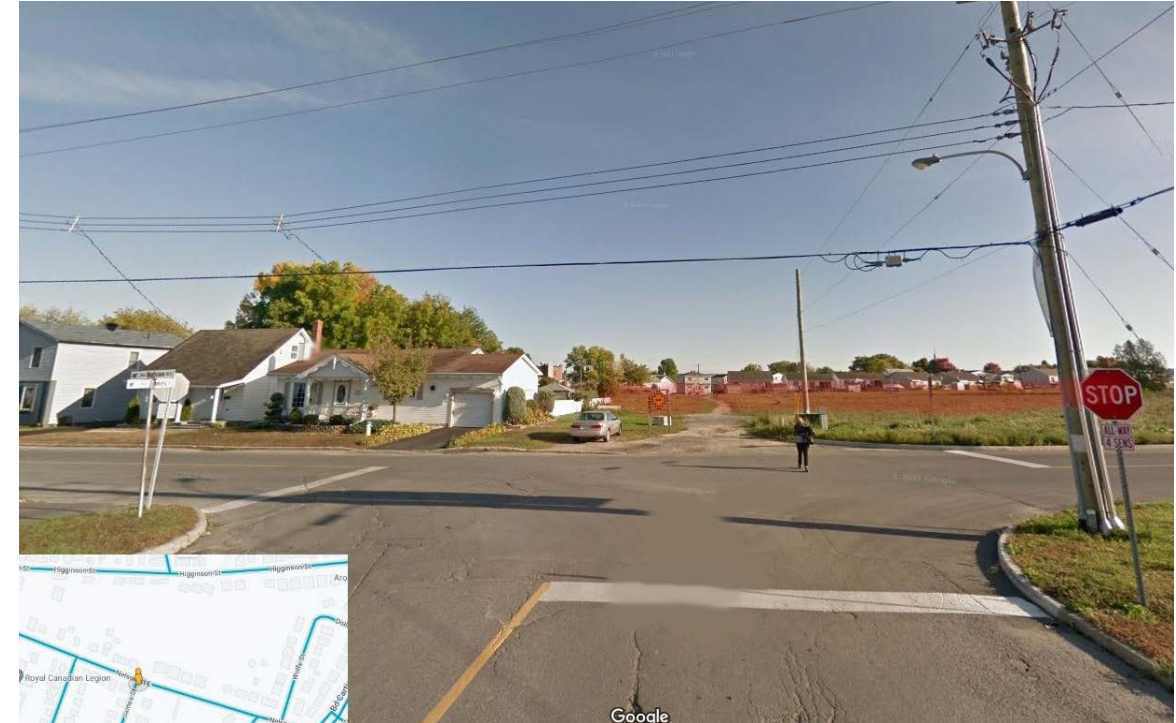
site in question, viewed from Nelson Street East at the intersection of James Street
